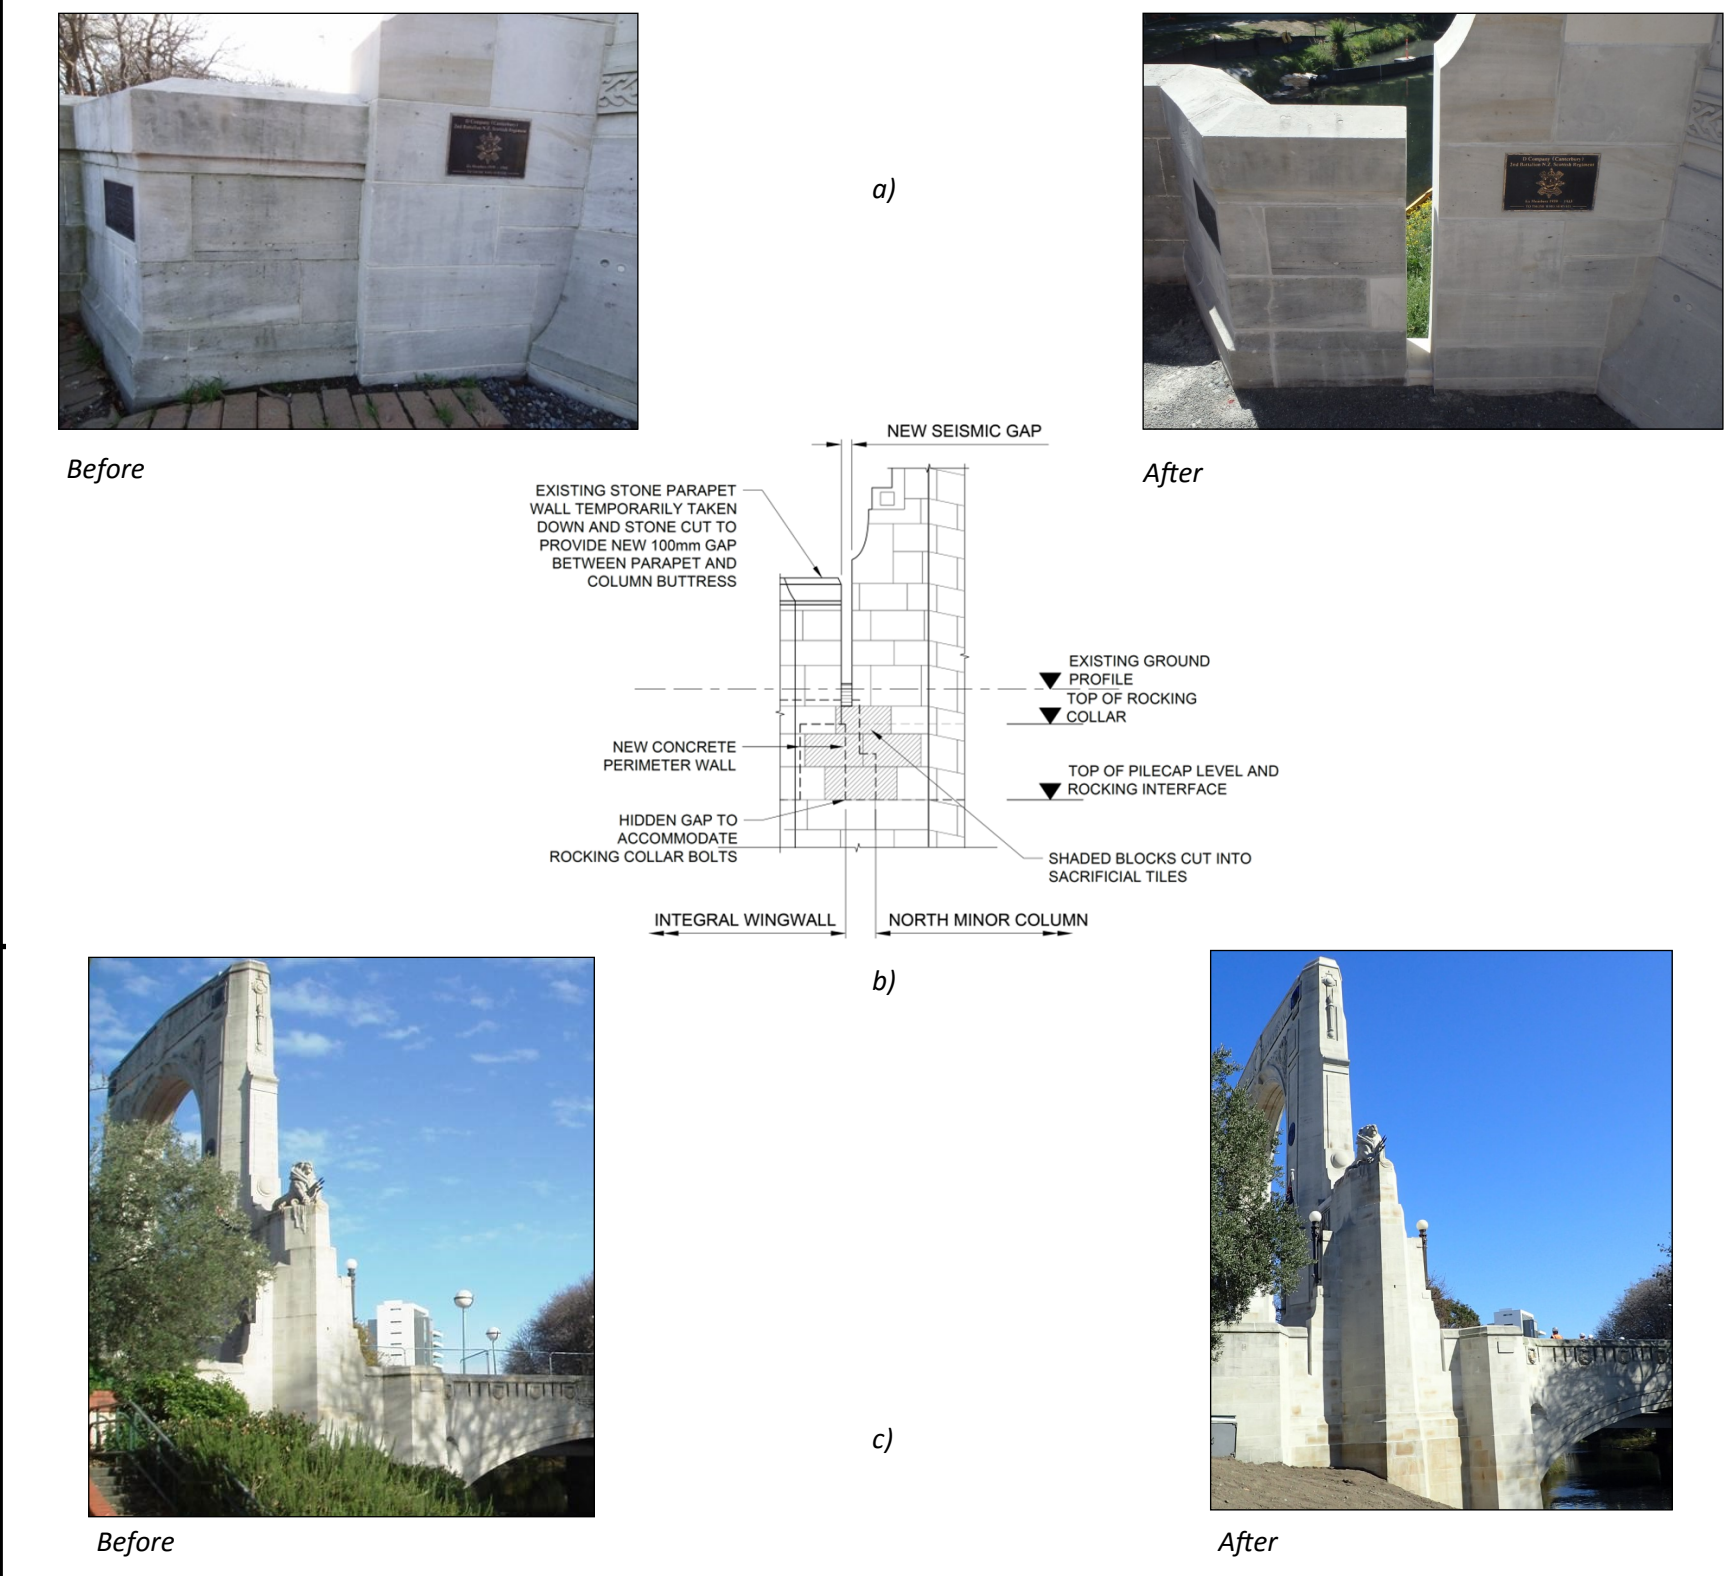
Modifications to address restraint from integral wingwall—introduction of seismic gap: a) view of parapet from on the bridge; b) summary of modifications to wingwall; c) view of parapet from river bank
